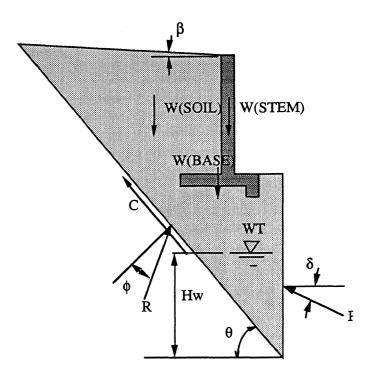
Assumed Wedge of Soil Sliding Toward the Lower Wall
